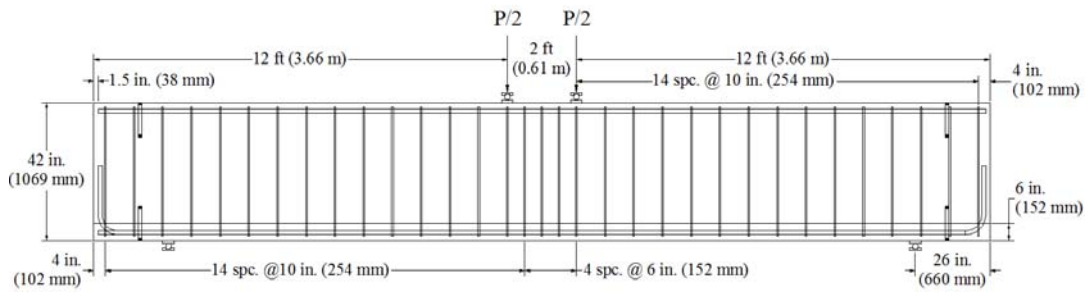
Elevation of specimen SPR IT.0.0(10).(5)
